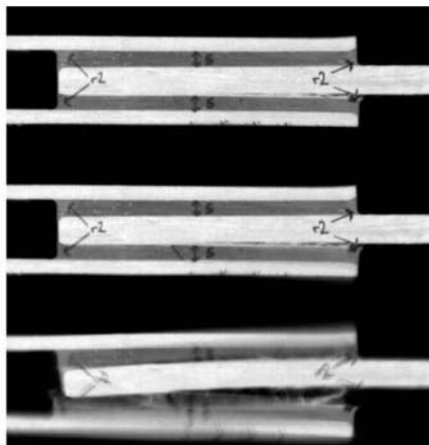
Typical brittle and explosive failure of a bonded joints composed of pultruded adherends (filmed at 2000 fps)
